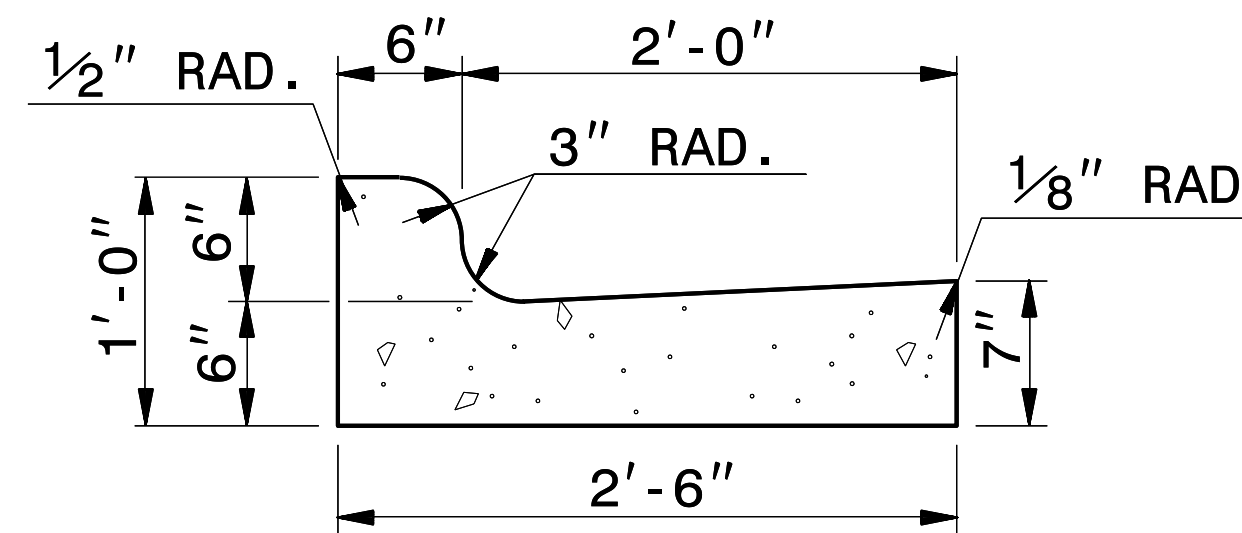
' TRANSITION FROM 2'-6" CURB & GUTTER TO 5'-0" PAVED SHOULDER
